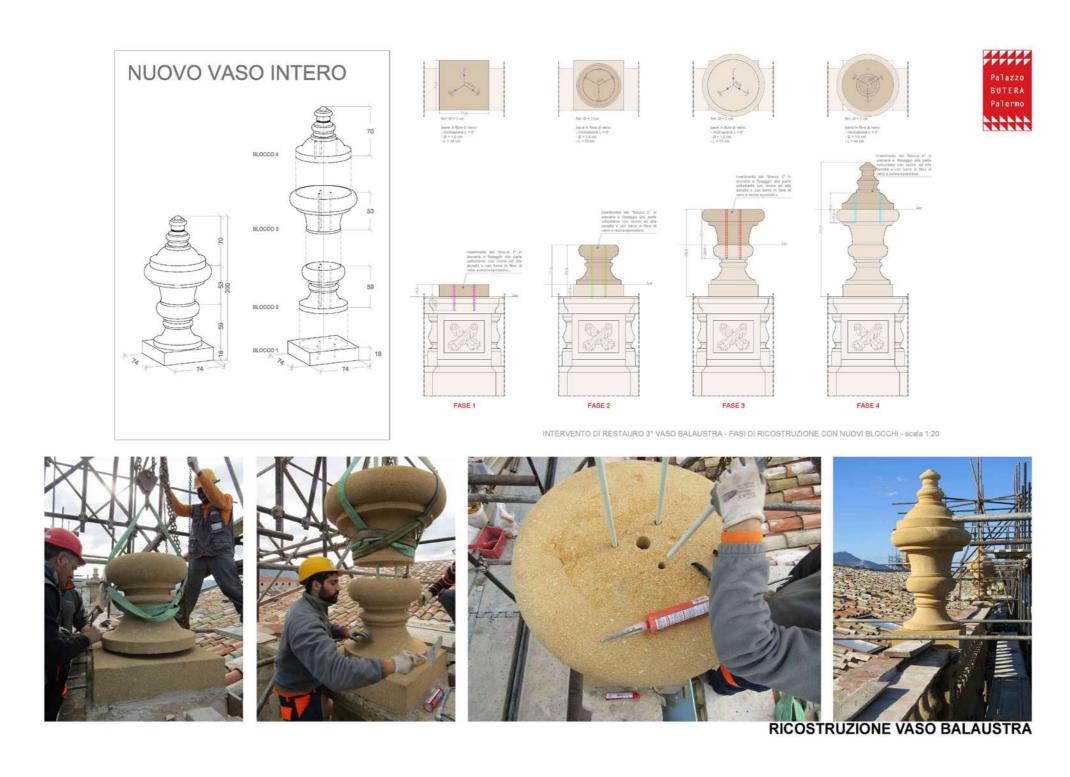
Reconstruction of a big stone vase located on the attic wall. © Project Designers
